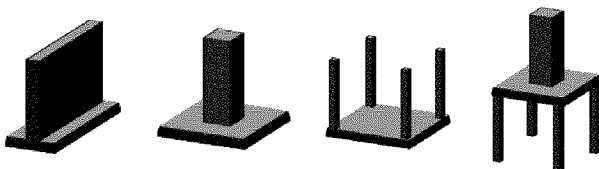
Typology of the most common types of foundations: strip footing; spread footing; mat (raft); piles
